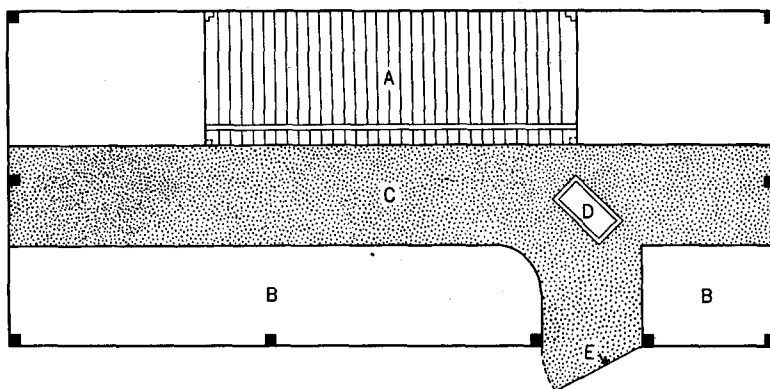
GROUND PLAN OF SIMPLE AVIARY, 23 FEET LONG, 10 FEET WIDE, SUGGESTED BY WESLEY PAGE.
